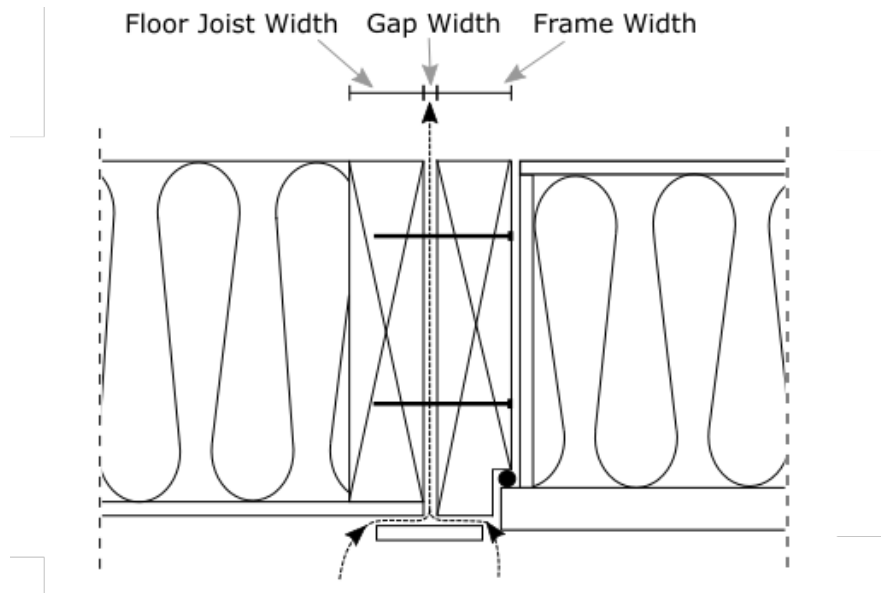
Figure showing leakage path in connection between attic hatch and attic floor joist.
